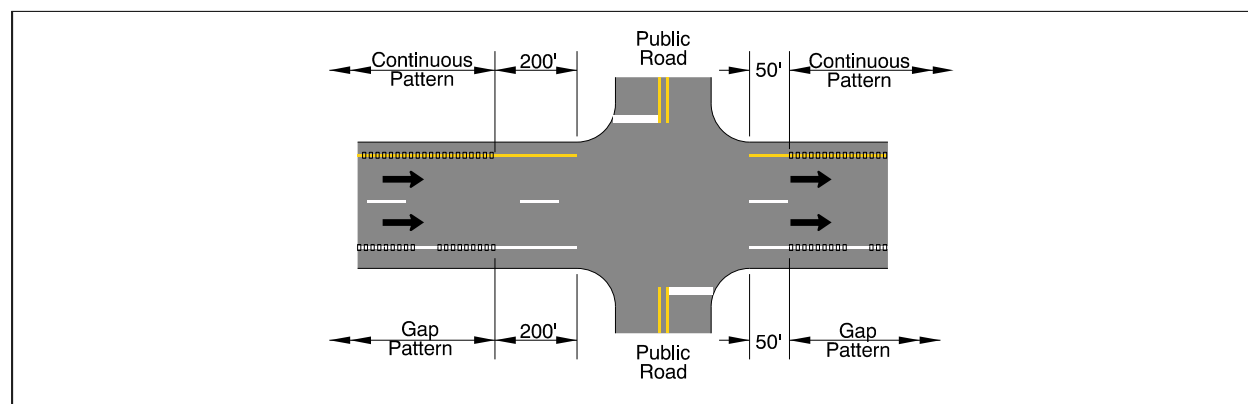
K: Typical Edge Line Rectangular Rumble Strip Placement at Rural Divided Highway T-Intersections
